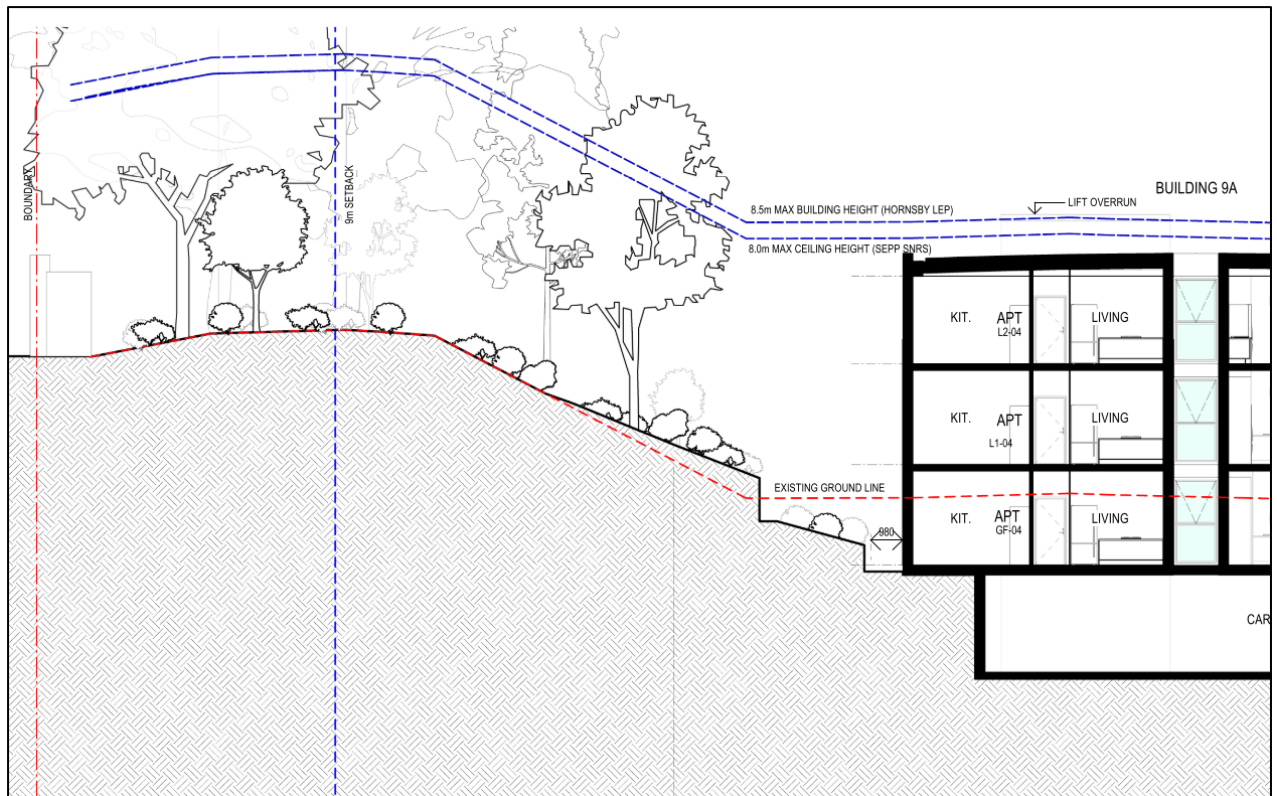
Typical section showing three storey building B9A adjacent to boundary (left of image). Note topography between building location and boundary. Section Plan shows 26m setback from boundary.
